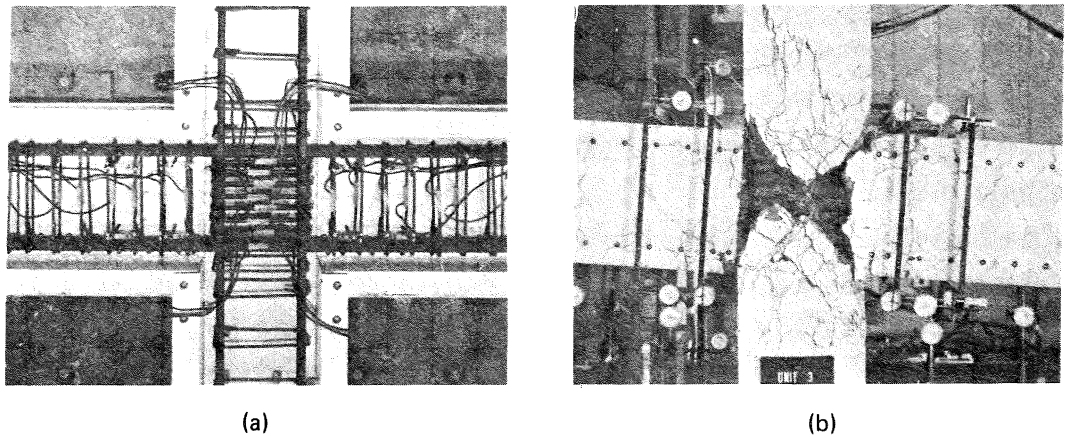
Reinforced Concrete Interior Beam-Column Joint:
